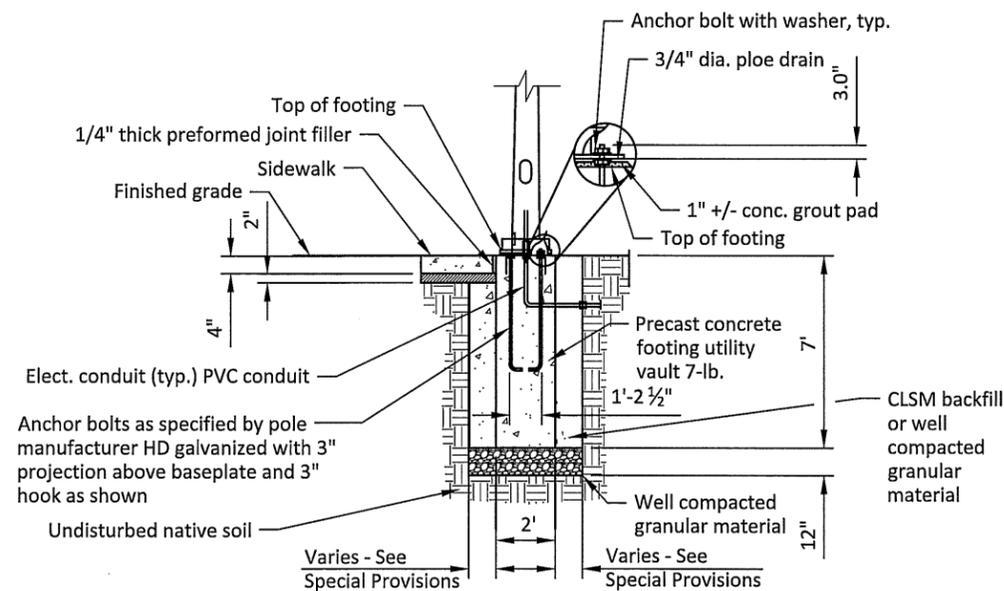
DETAIL A - TYPICAL STREET LIGHT (CURB - TIGHT SIDEWALK)
